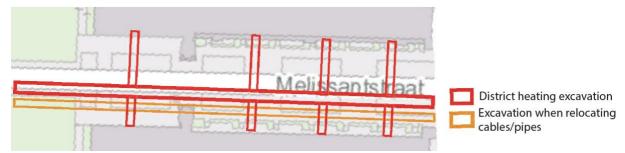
Top view of the Melissantstraat: excavation in situation 2
